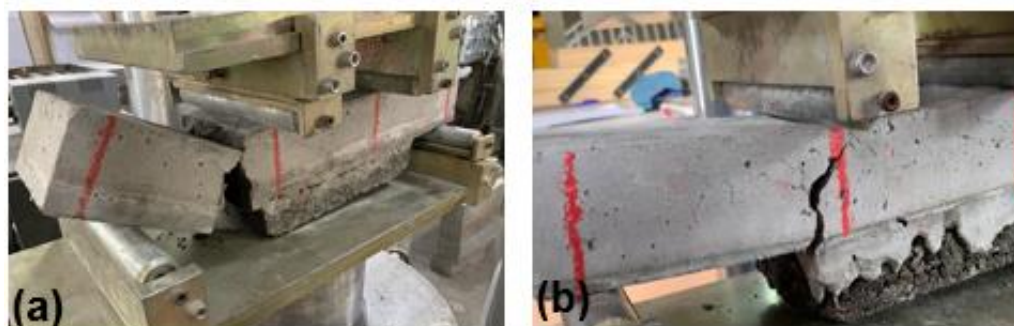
Composite beams failures on composite beams: (a) plain concrete overlay; and (b) steel fiber reinforced concrete overlay
